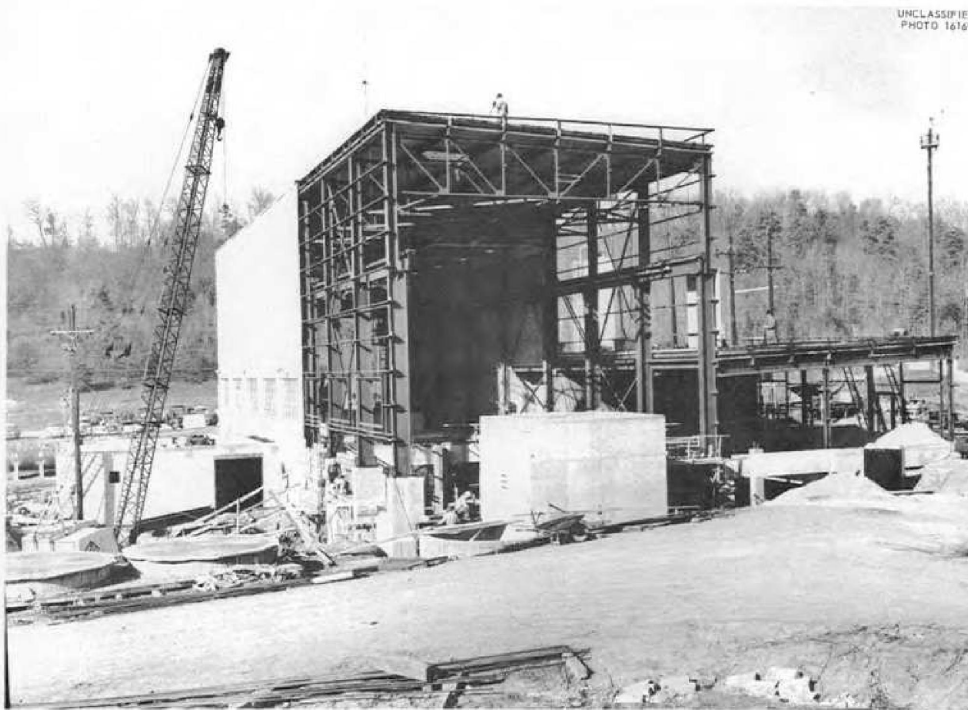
Structural Steel for Additions to Building. January 1956.
